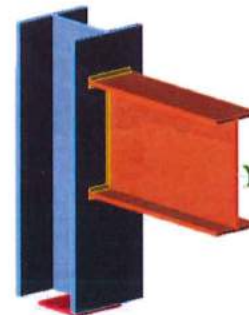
Benchmark case for welded eaves moment joint (IPE400 to HEB300)
